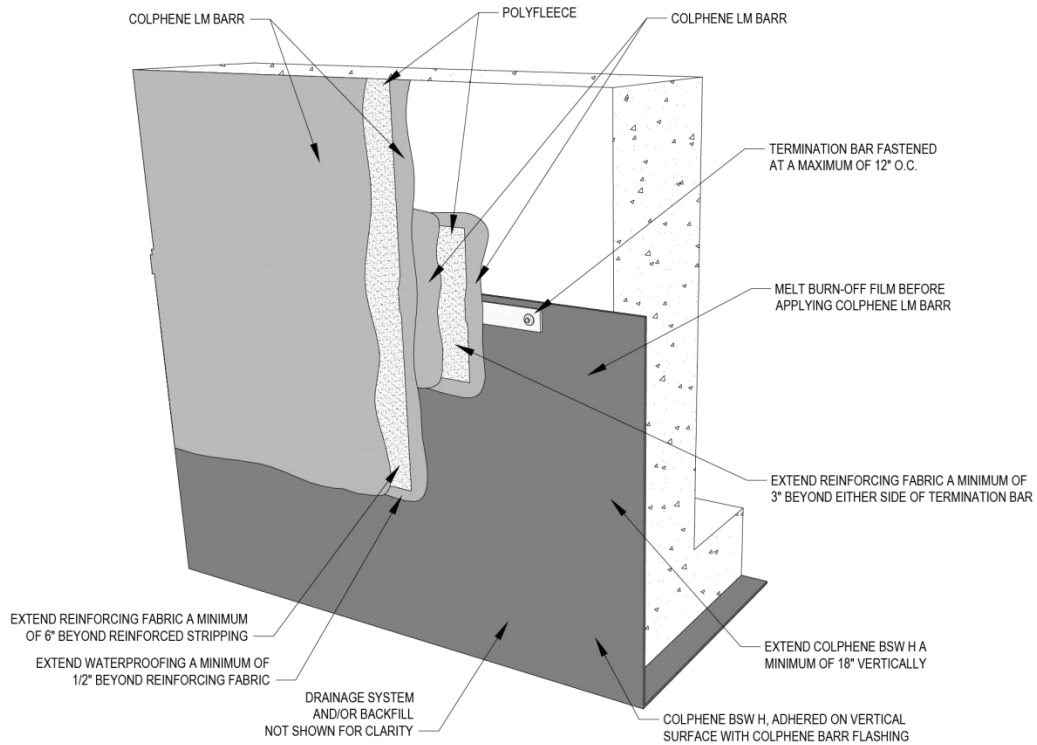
Reinforced Tie-In to Blindsided Waterproofing Membrane
